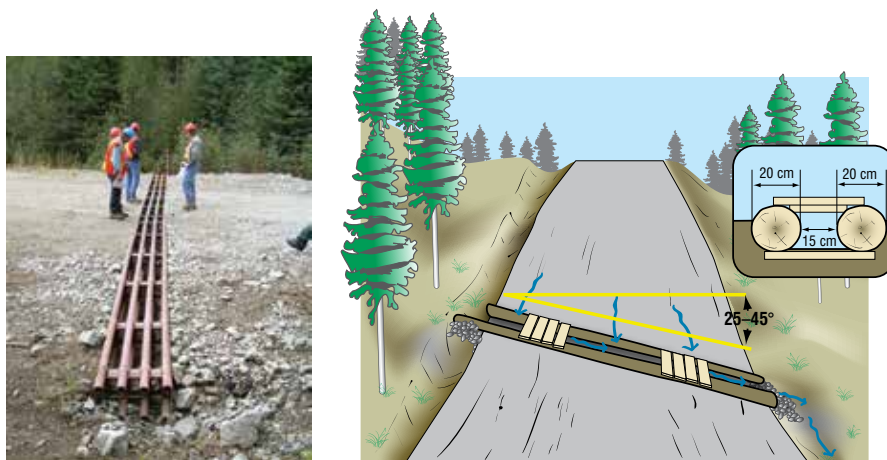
Open-top surface drains are placed through the road. The top section of the drain in the photo can be removed to allow for cleaning and removal of sediment. The schematic shows a typical log structure.
